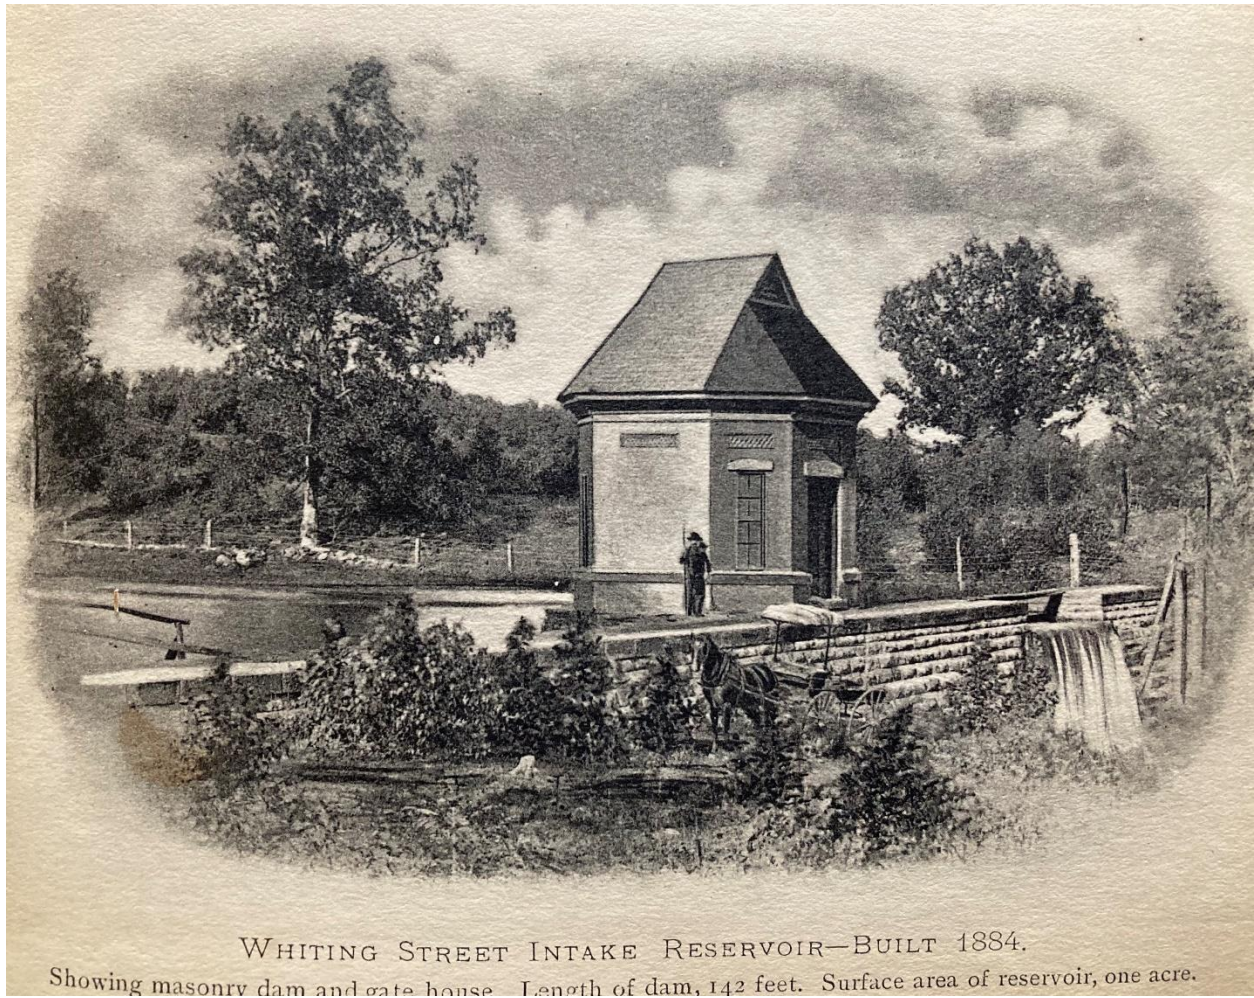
Drawing depicting the gate house and the original Whiting Street Reservoir and dam built in 1884
